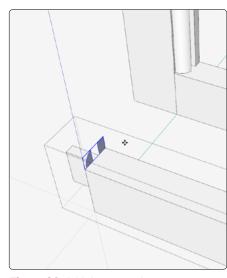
Do some clean-up after adding the molding-and-groove shape.
